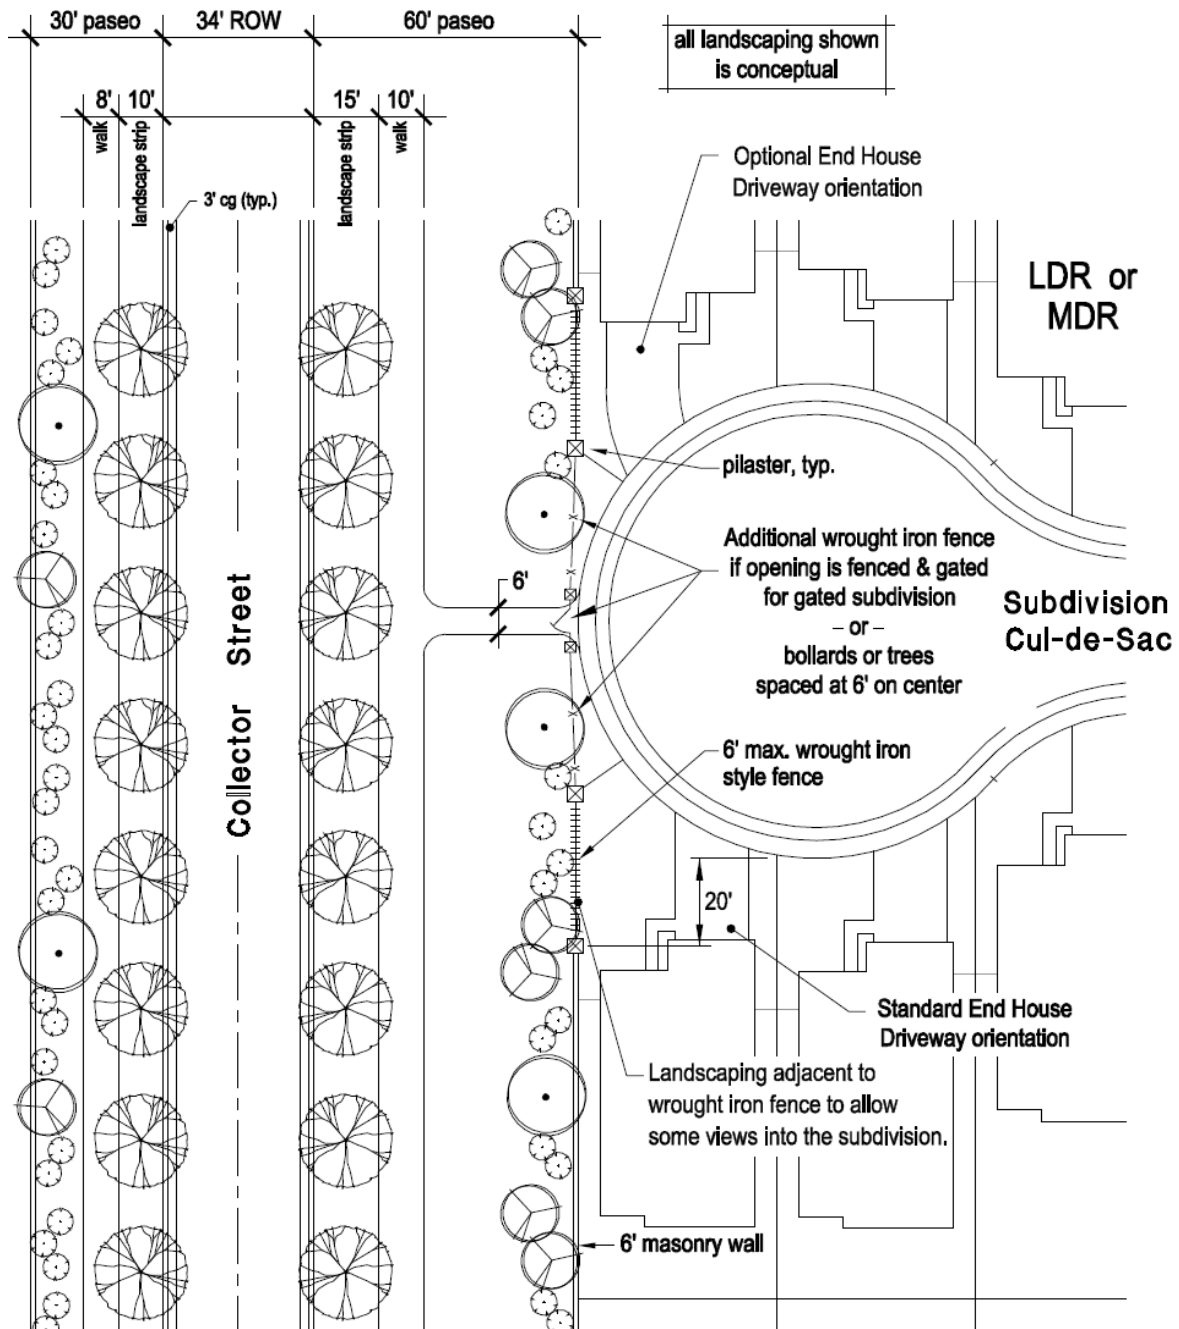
Collector Street Paseo Connection at Cul-de-Sac
